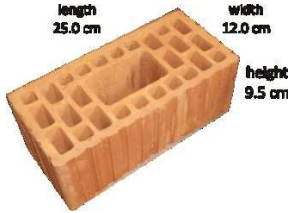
Clay block masonry units used in the experimental study to construct the masonry infill wall.
